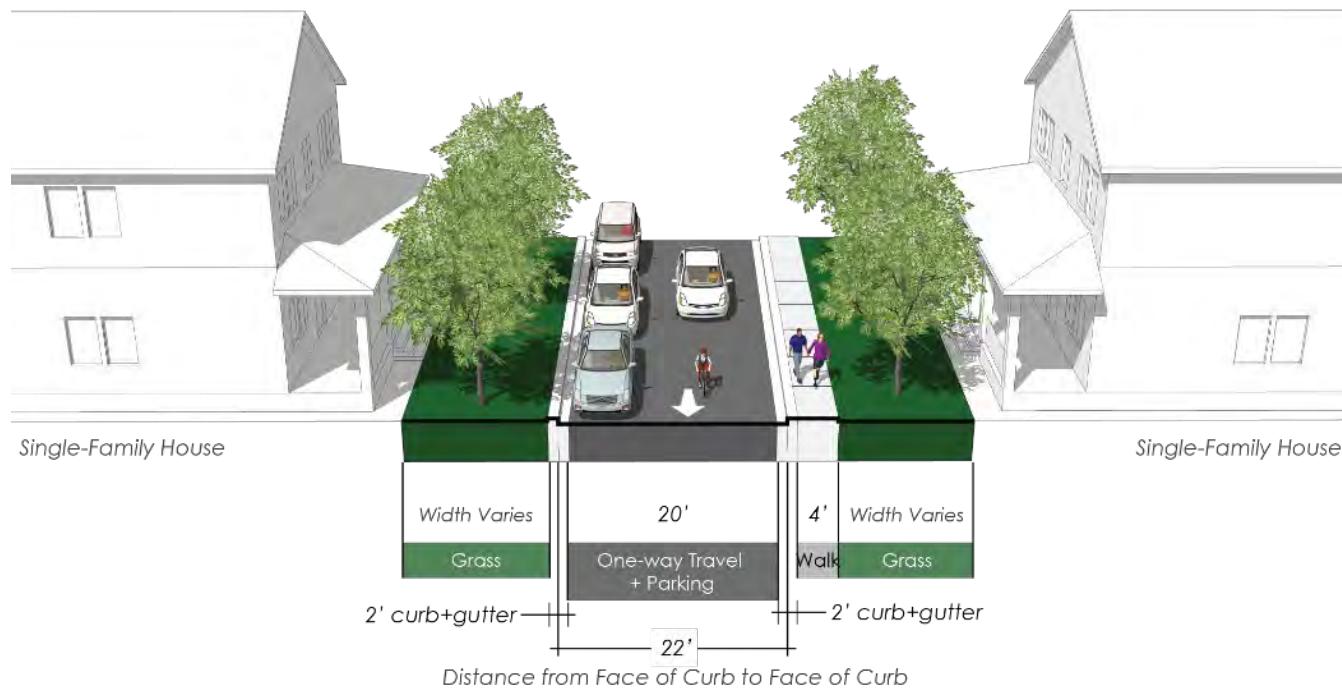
Chase Avenue – Tilbury Street to Pearl Street (Looking East)
